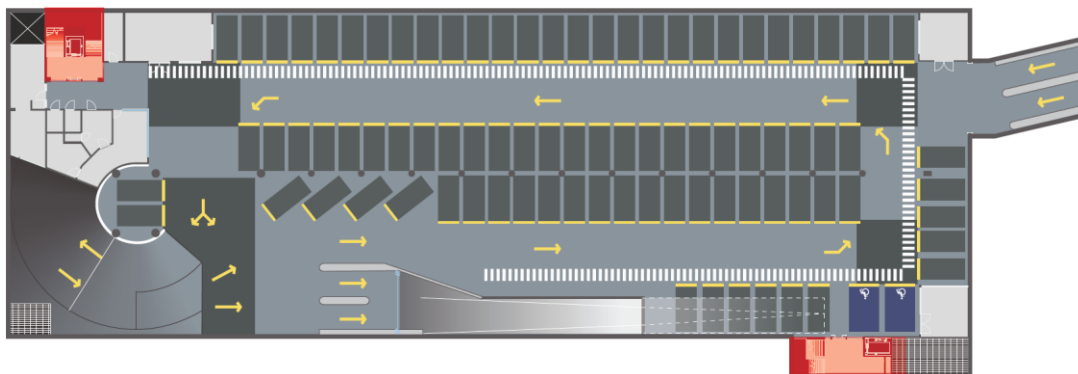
floor plan parking garage (source: Dura Vermeer project informatieboekje).
